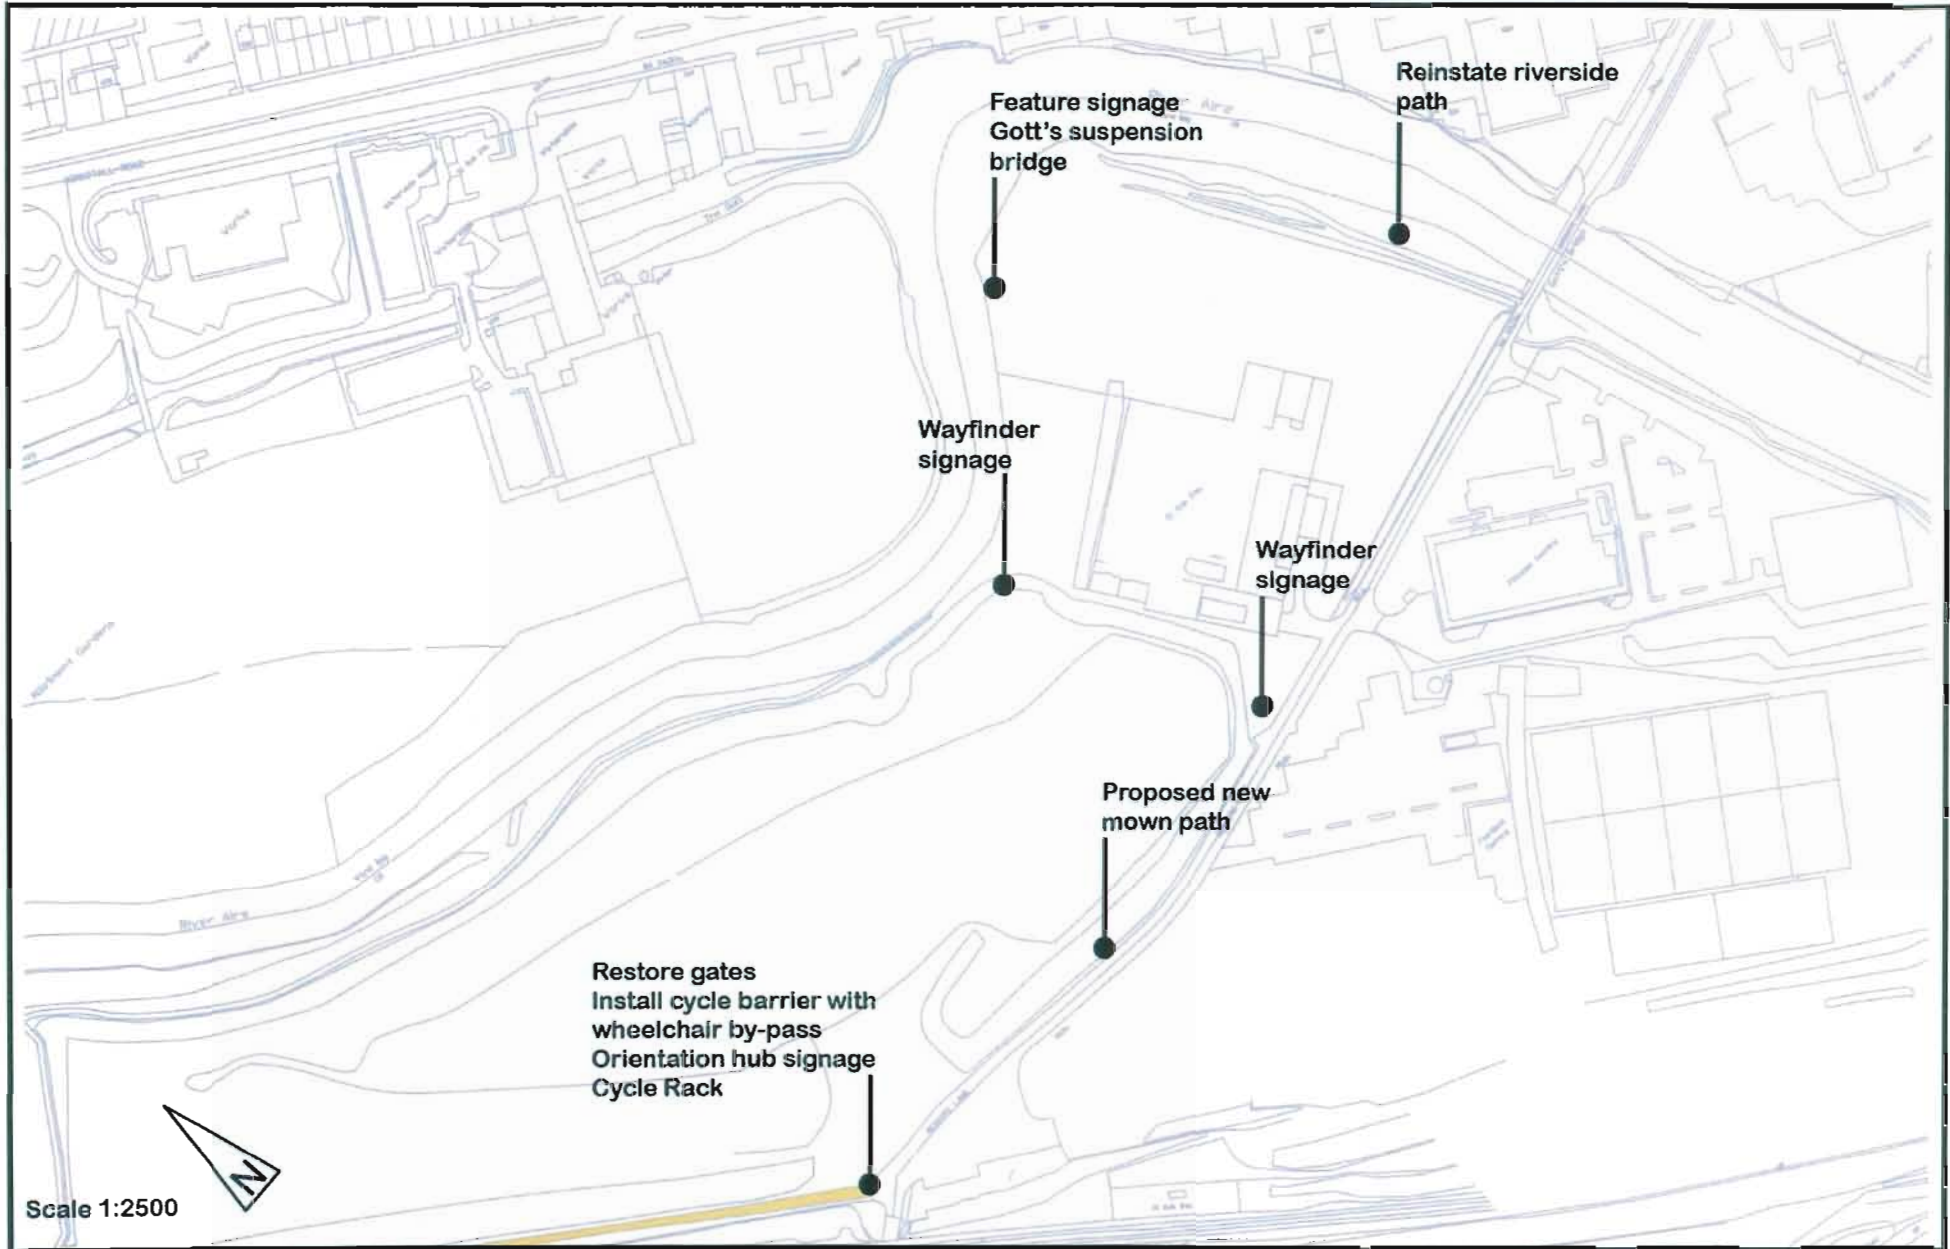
DETAIL B: ST ANN'S MILLS AND NEW BRIDGE
